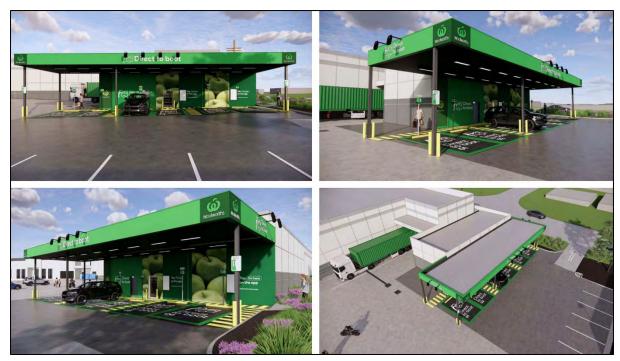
Excerpt of the Proposed Renders illustrating perspectives of the proposed development.
